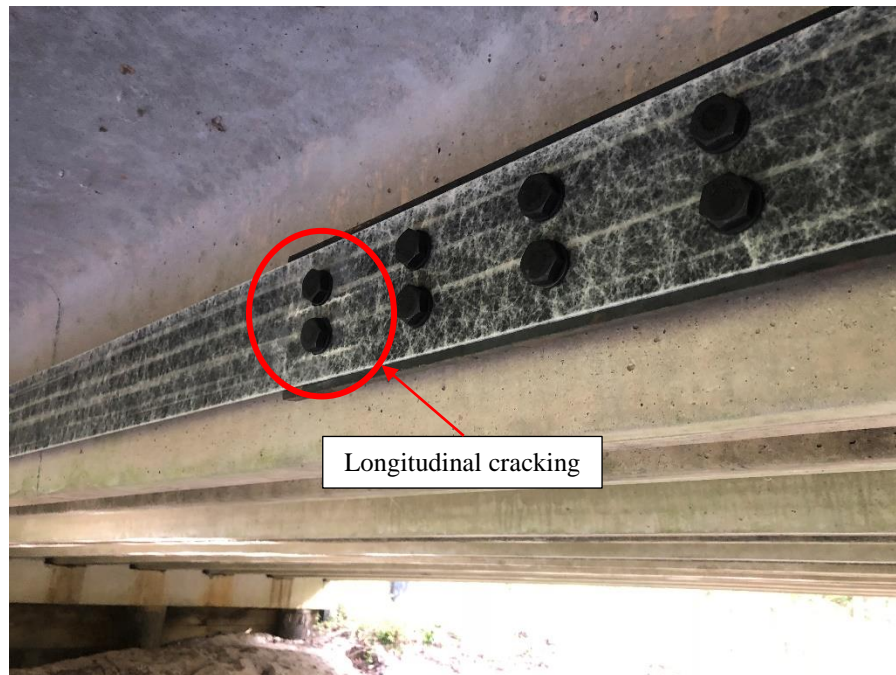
Longitudinal cracks on MF-FRP plate.
